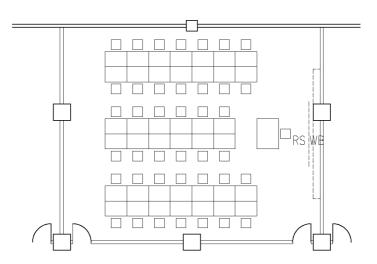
Dedicated Computer Teaching Laboratory Floor Plan
